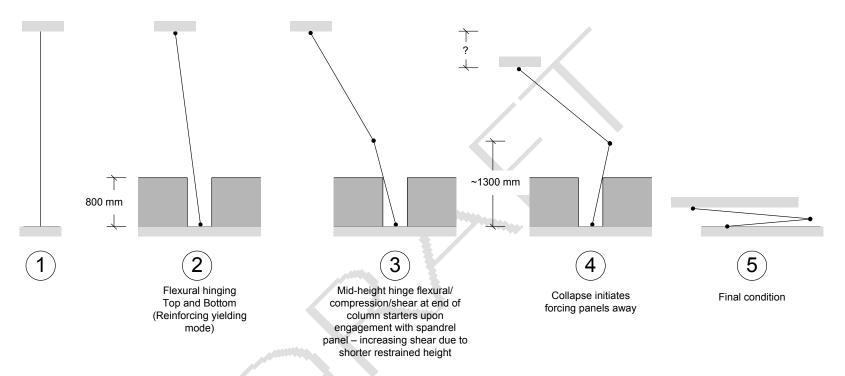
Perimeter column collapse mechanism development from interaction with spandrel panels
